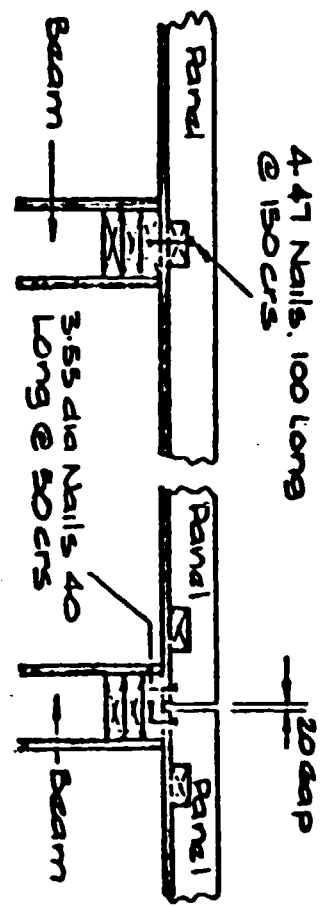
TYPICAL BEAM & COLUMN CONSTRUCTION
